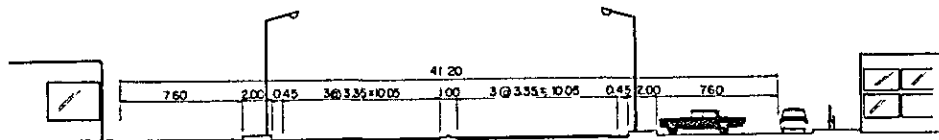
WIDENED CROSS SECTION OF VIA ESPANA(1)
